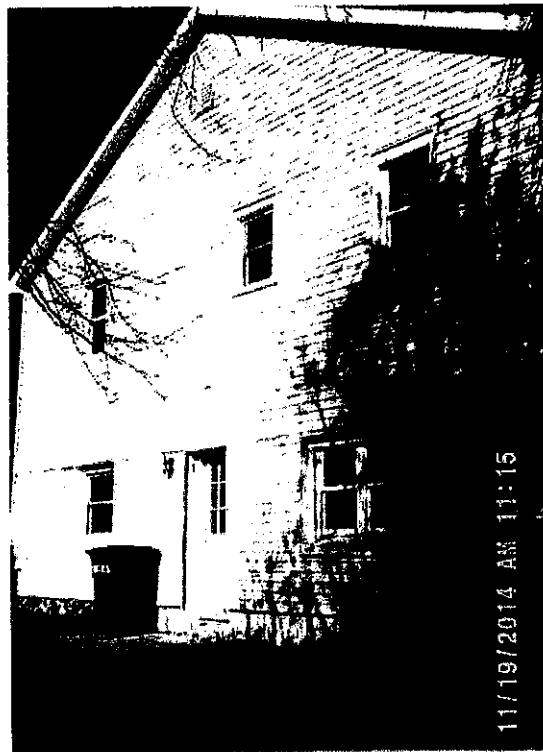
This photograph depicts the southern face and entryway to the lower apartment of the residential building.
